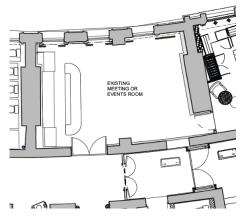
extract from existing first floor plan (ref: 2474.PL.003)
